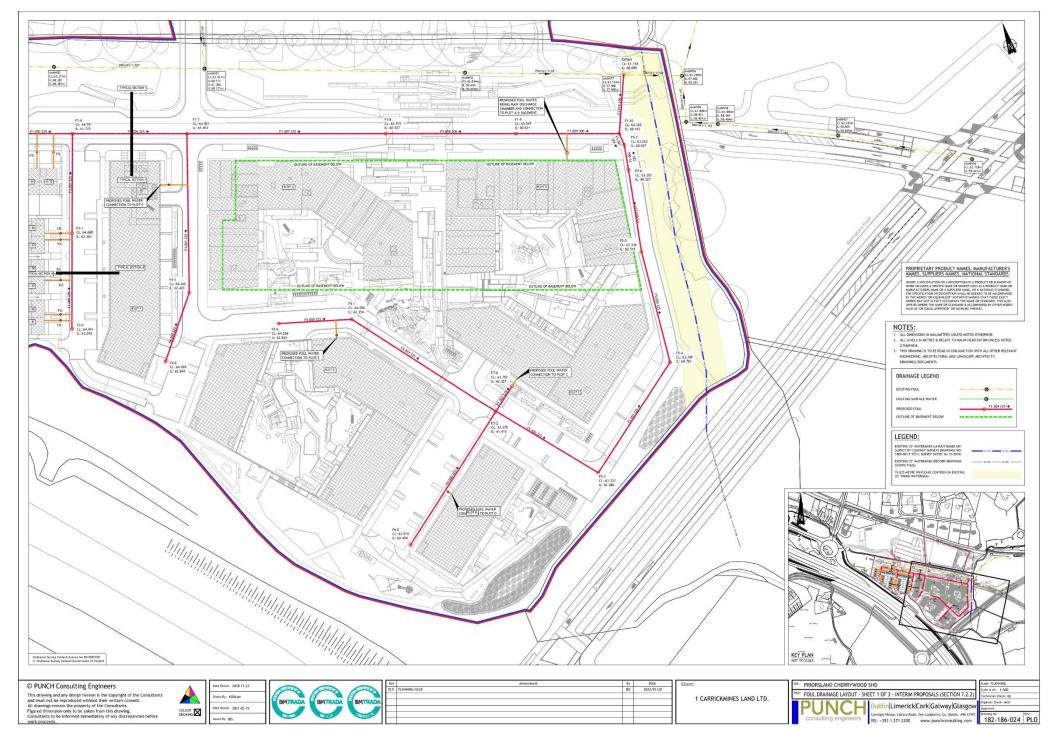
Foul water drainage – Interim Proposal (sheet 1)
